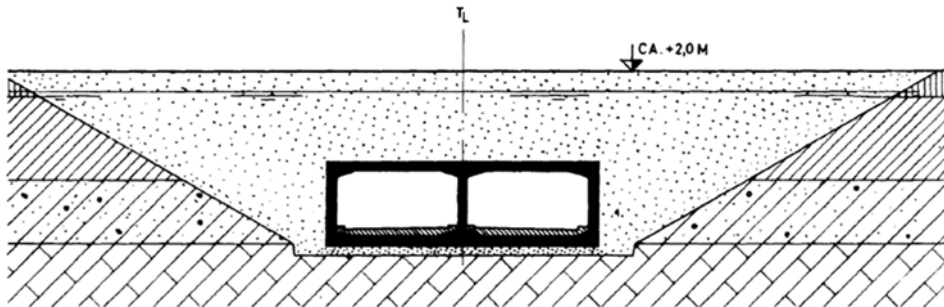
Cross section in tunnel trench, southern end (under quay area).
